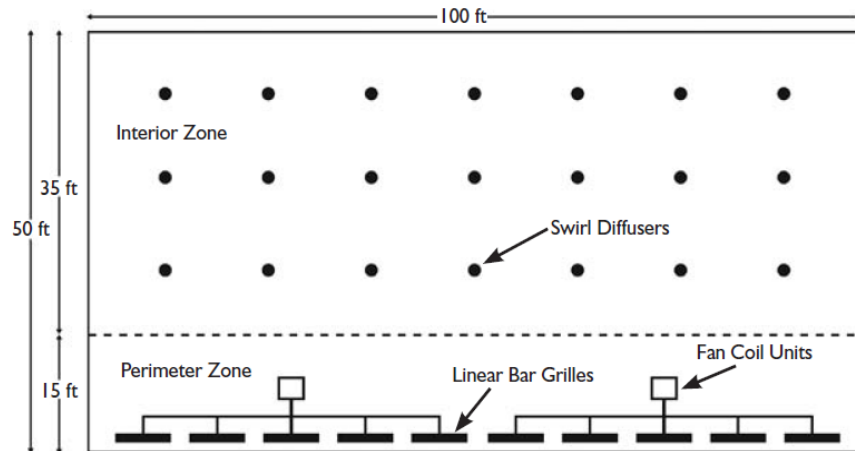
Floor plan for design tool example showing diffusers and underfloor fan coil units.
